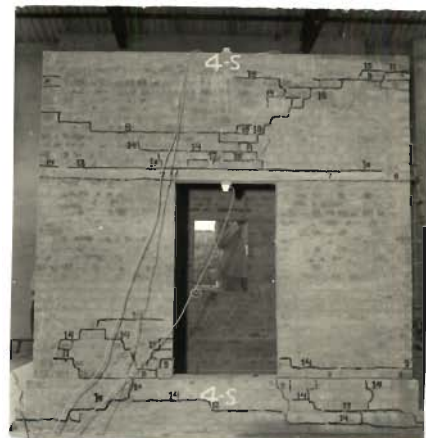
\_ TOP SPANDREL AND BOTTOM REGION OF SOUTH WALL MORE CRACKED (MODEL 4)
